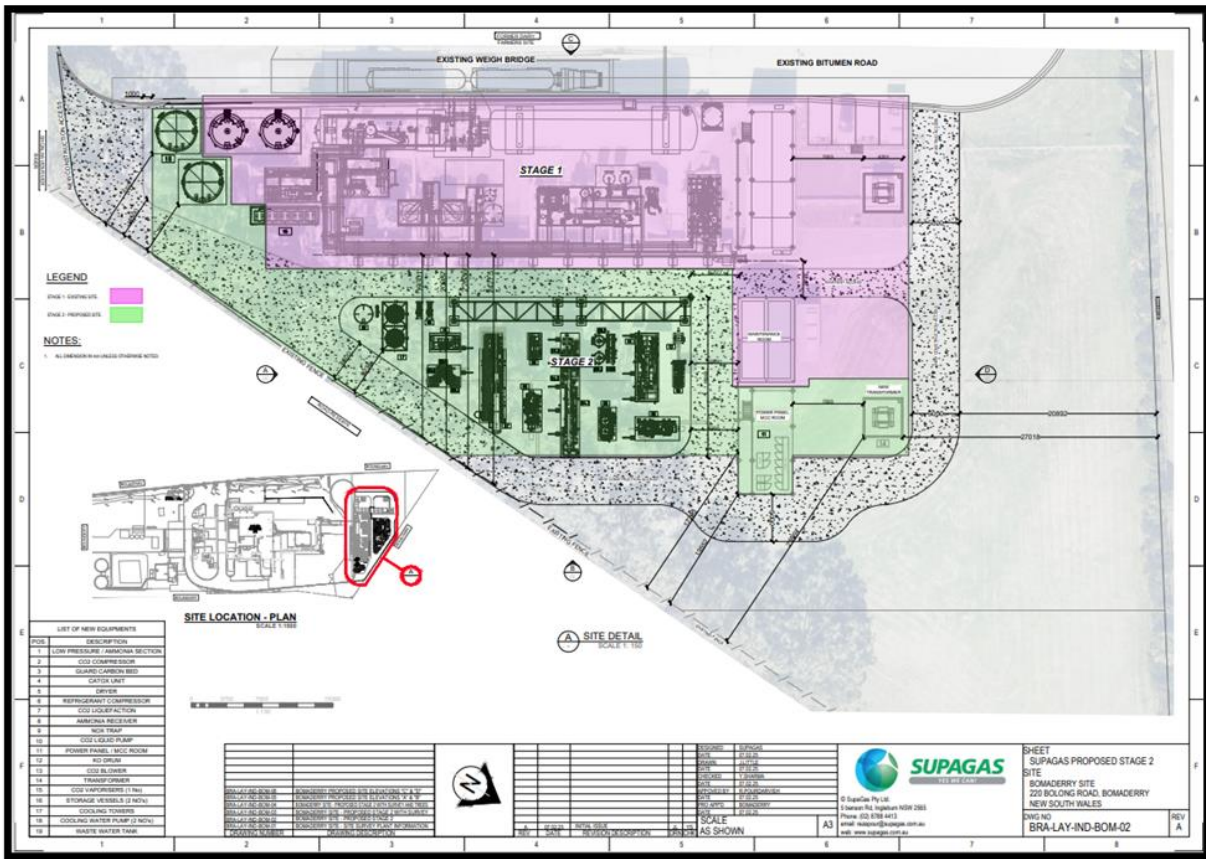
Proposed modified CO₂ Plant Stage 2 layout
